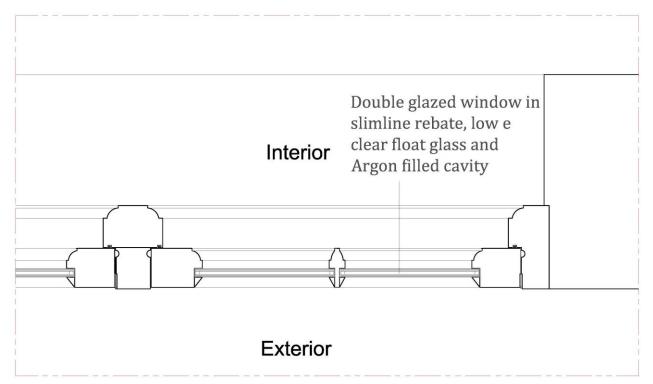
Details of the proposed double glazed glazed, timber casement windows
